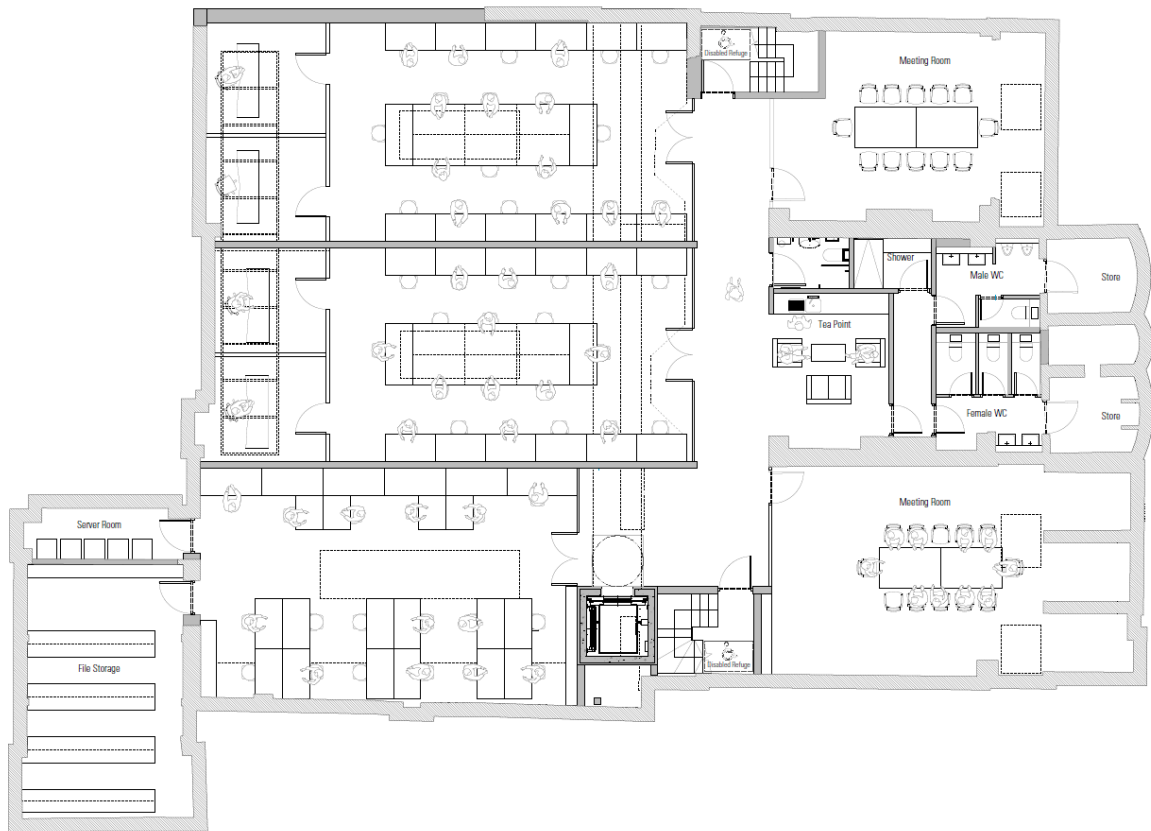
Proposed Flexible Layout (Lower Ground)
